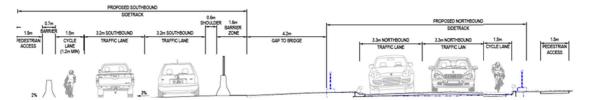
Indicative cross section through the temporary sidetrack and Commonwealth Avenue southbound carriageway during demolition of the Commonwealth Avenue northbound bridge
